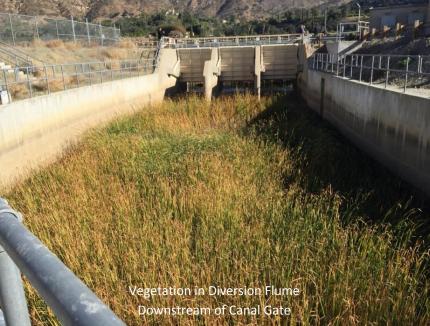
Site Visit Photo Summary, Sheet 1 of 2
